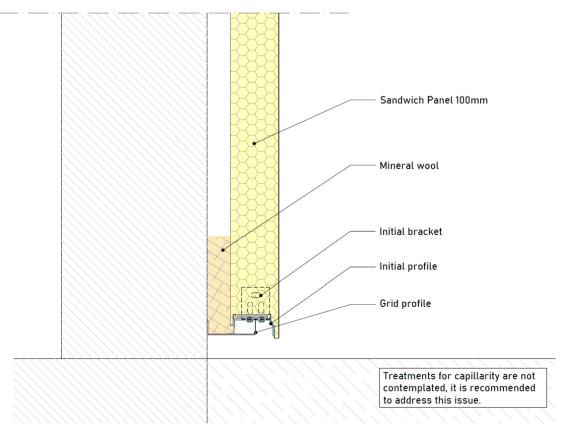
Detail drawing of the façade system's starting point [drawing created using AutoCAD]
